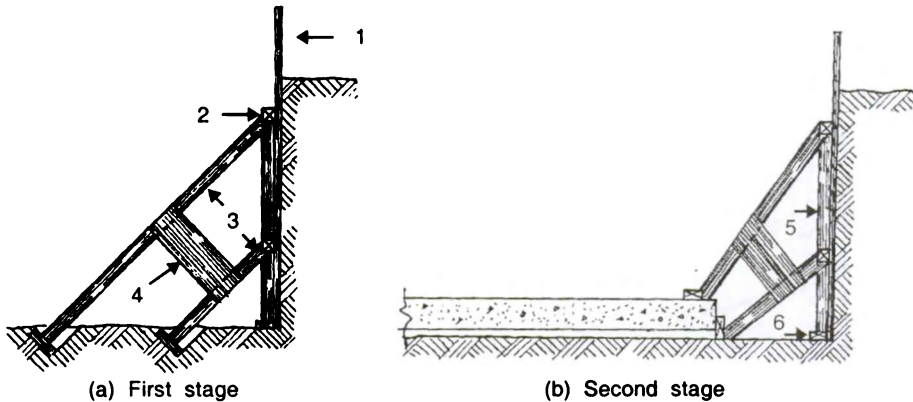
Timbering of excavation for basements: 1. Vertical face timbering projecting above G.L. for safety of workers, 2. Horizontal waling, 3. Raking struts, 4. Binders to struts provided on both sides, 5. Vertical punches at 2 m centers, 6. Sole plate.
